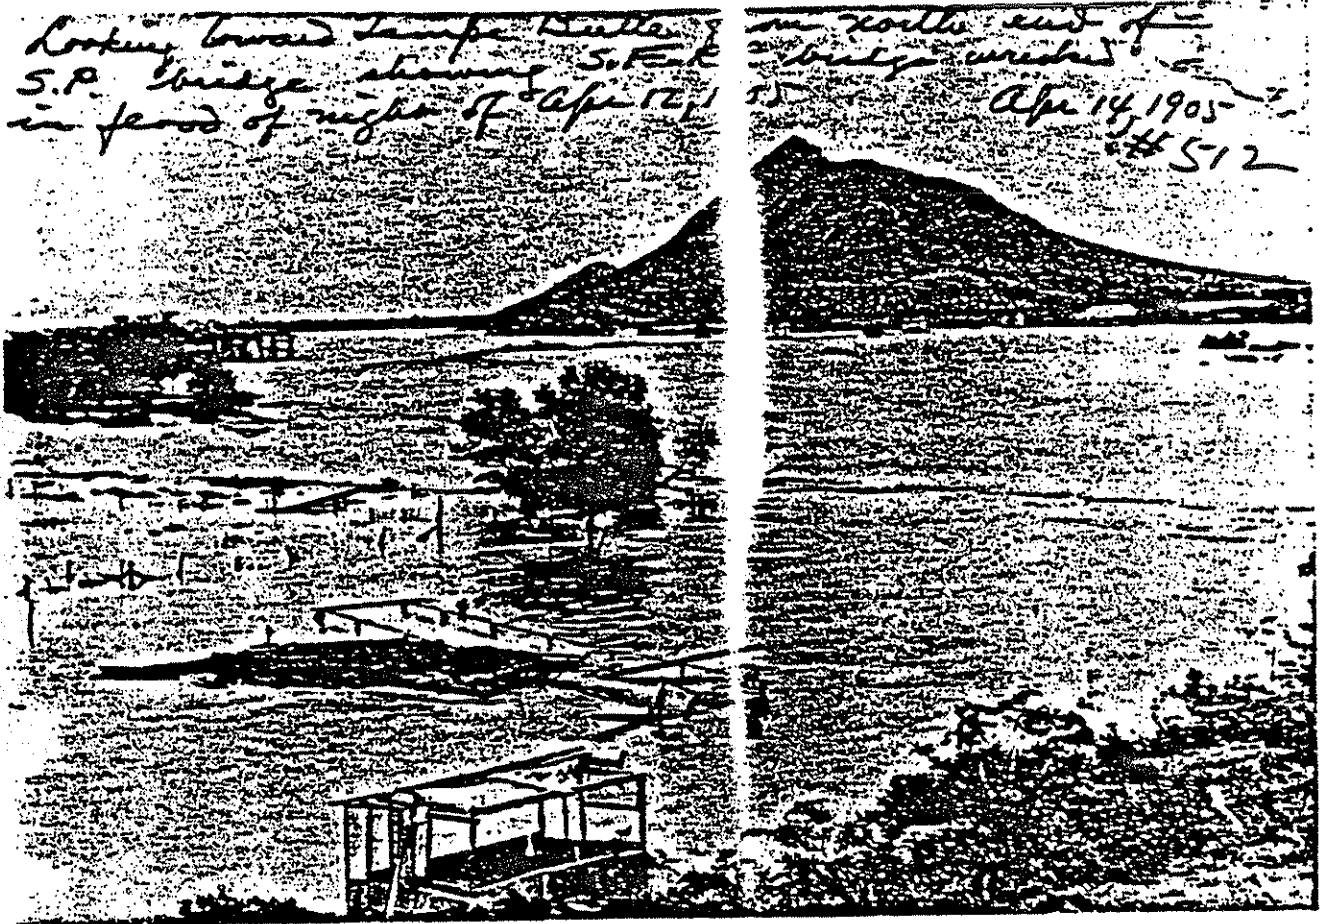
Flood on the Salt River, 1905. Note railroad bridge.
